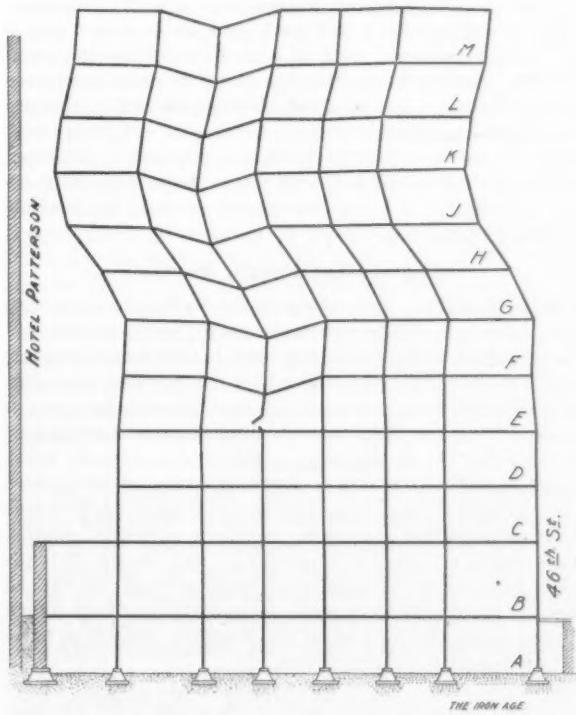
Side Elevation of the Steel Frame, showing in slightly exaggerated form the failure of the column on the fourth floor, resulting in the collapse of the structure above it, which crashed through the lower portion of the building. The break occurring just back of the center of the floor, the structure had a natural tendency to fall toward its center, the greater amount of metal in the front, however, pushing the rear portion backward.
